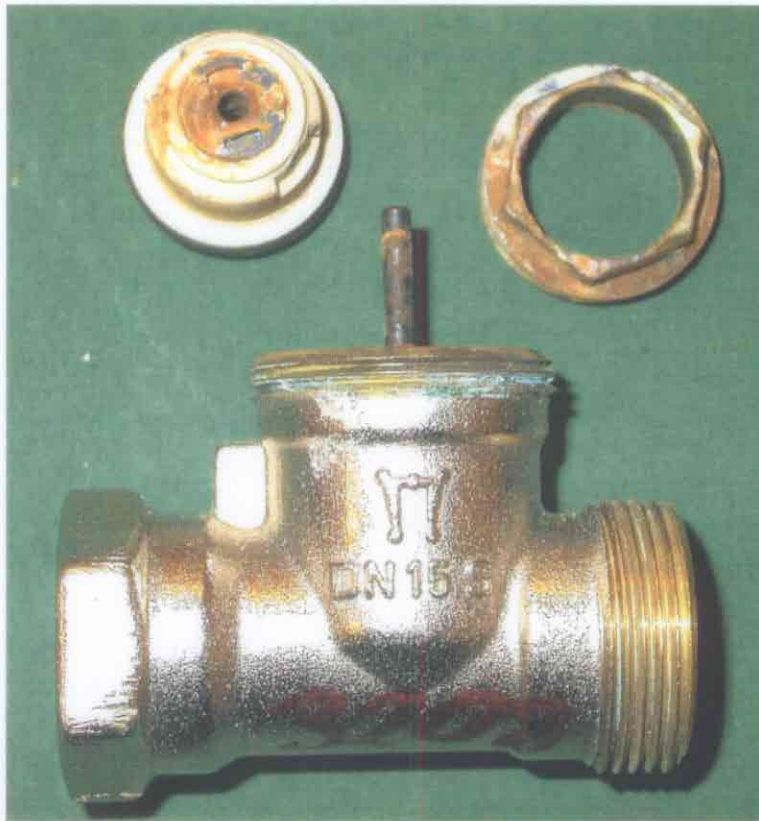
Motor valve. Precipitated corrosion products and particles are seen at mechanical parts
